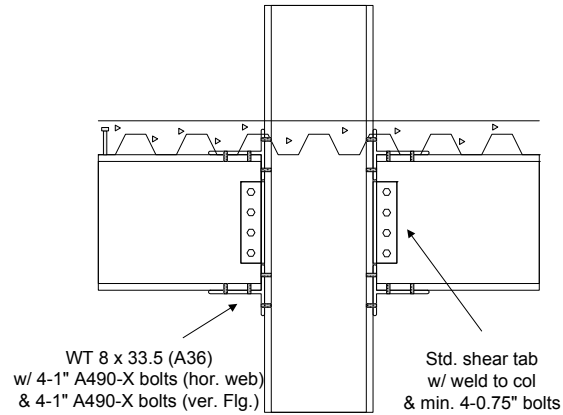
Typical T-Stub connection detail (Maison and Kasai, 2000).
